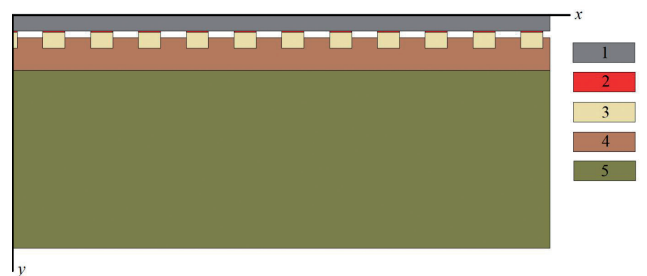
The railway track laid on the roadbed: 1 – rail, 2 – dampers, 3 – sleepers, 4 – ballast, 5 – earthen bed.
